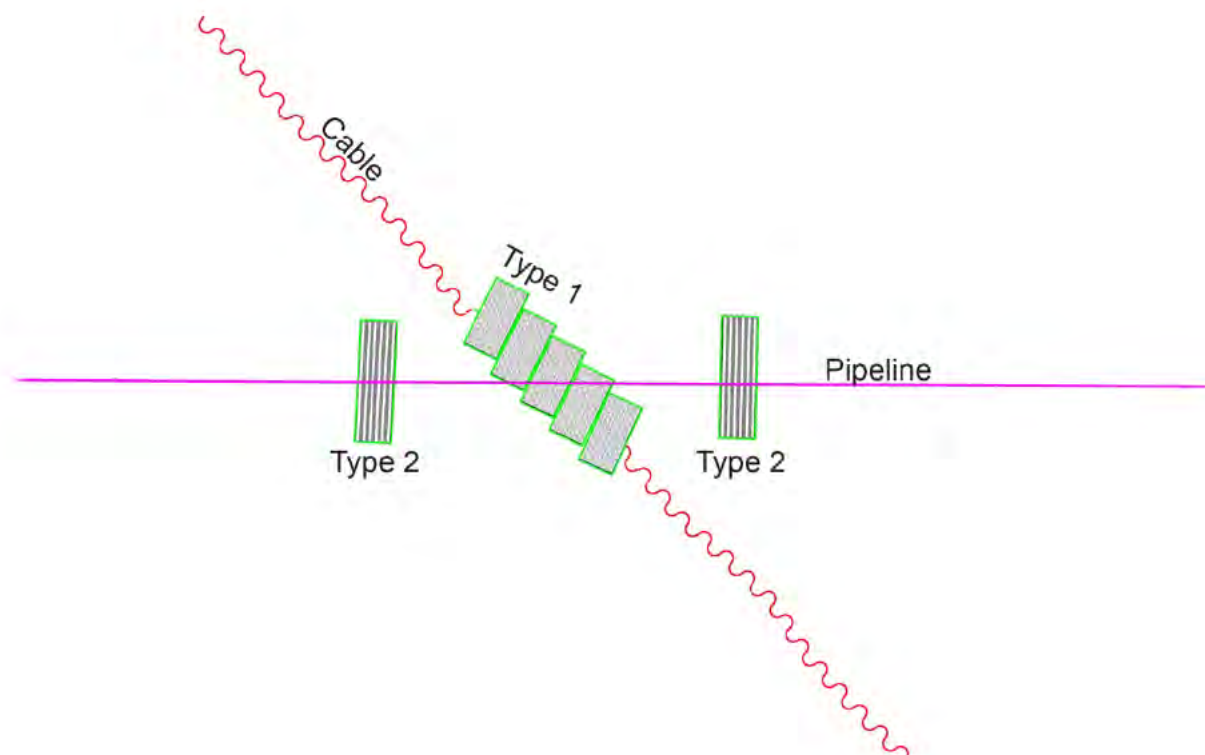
Schematic drawing of a typical arrangement of mattresses at a cable crossing /7/
